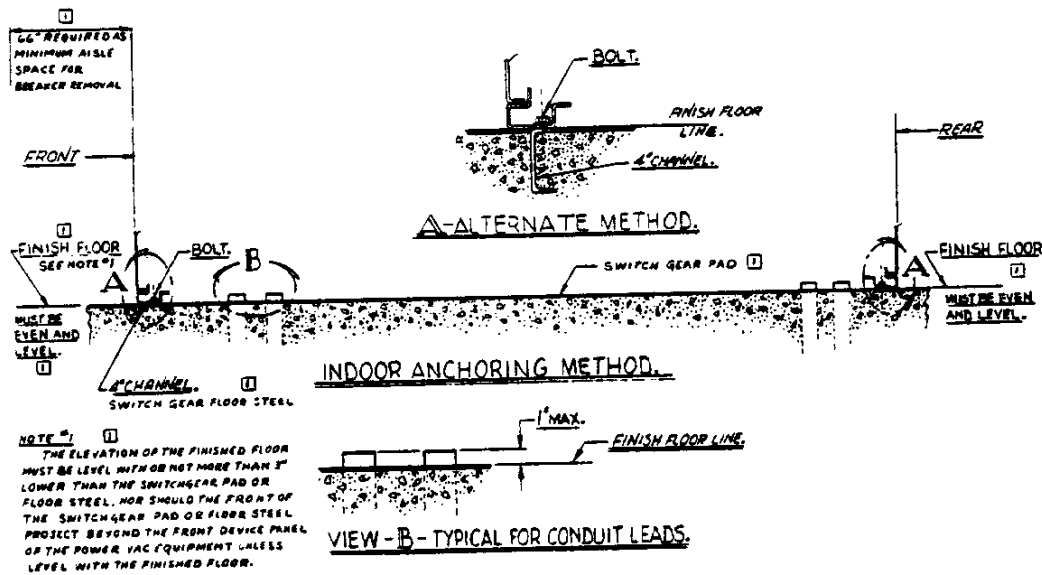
Installation Details for Indoor Power/Vac* Metal-Clad Switchgear (Continued)
